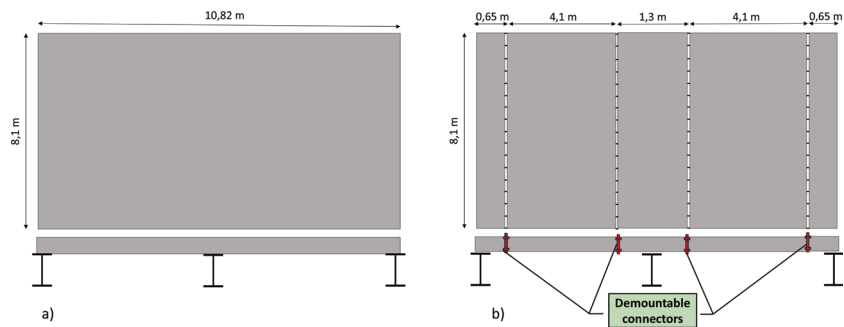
a) Conventional and b) demountable steel-concrete hybrid floor systems (not in scale).
